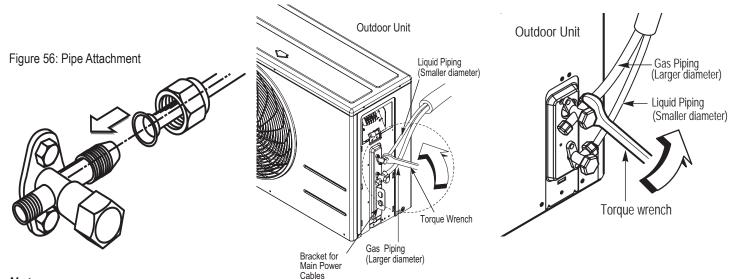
Outdoor Unit Piping Connection (HV3, HLV)
